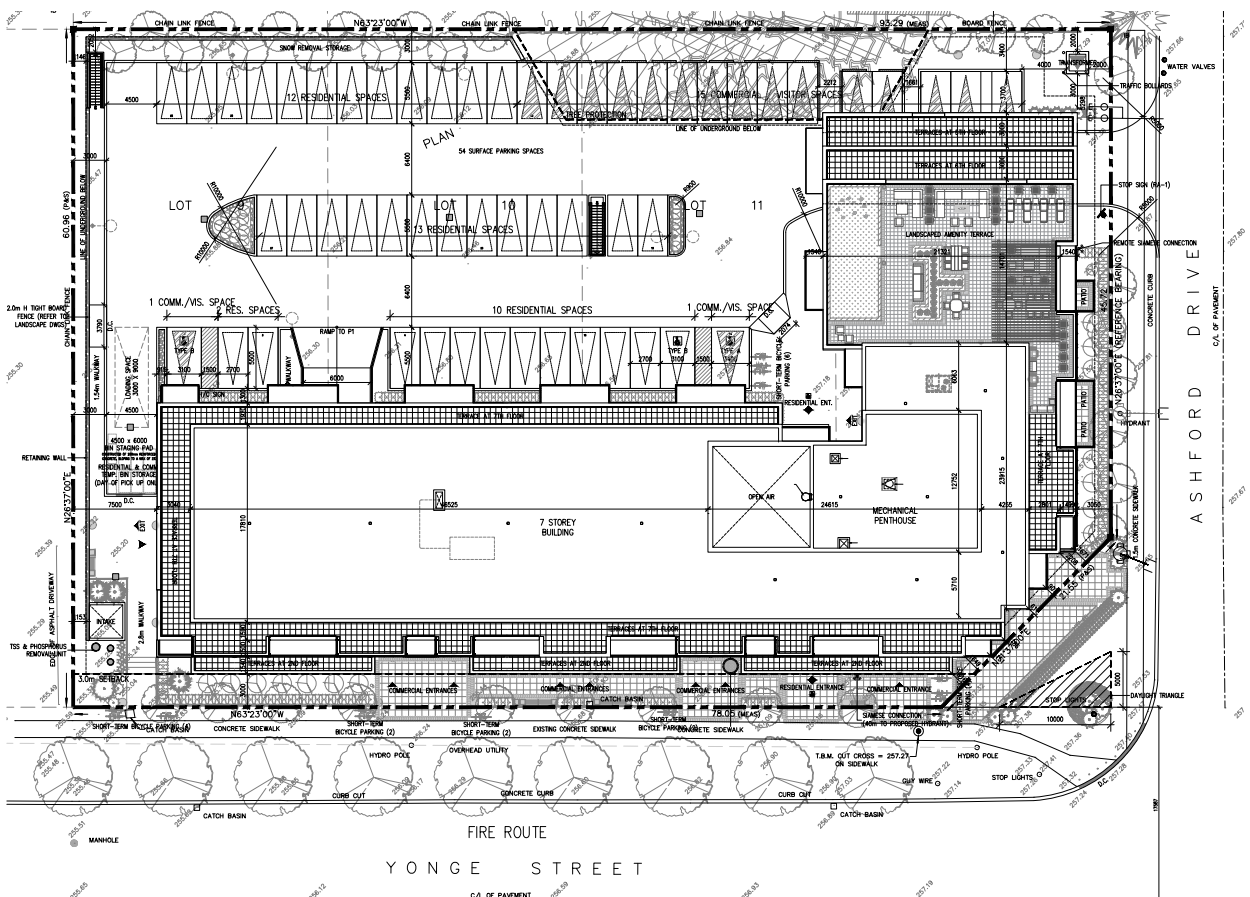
Site Plan for 681 & 685 Yonge Street (South District Condominiums)
